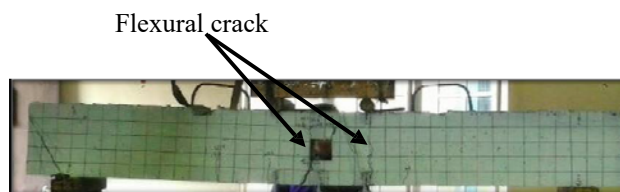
Bending failure of beam B2 at load 26.67 kN
